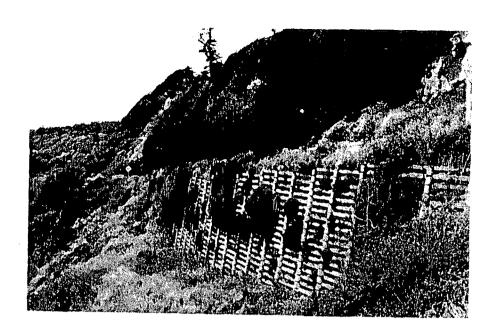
Vegetated, open-front crib wall supporting coastal roadway. Colorful native shrubs and plants have become established in the openings between structural members at the face of the wall. Trinidad Beach, California.
